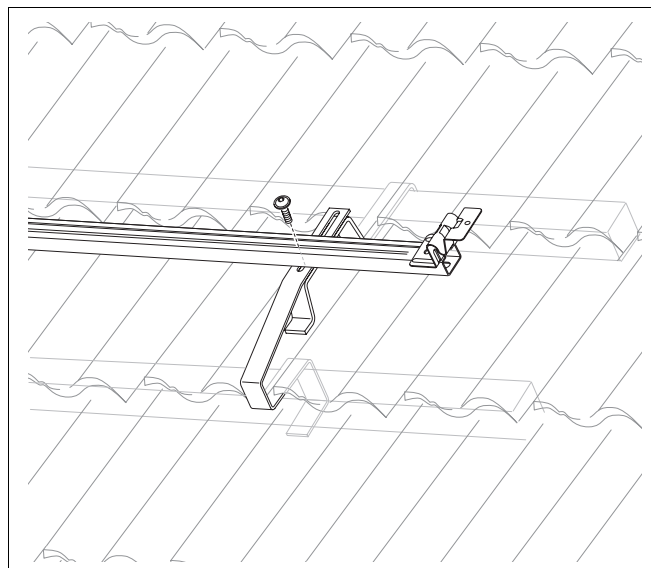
Screw preassembled profile rail to roof hook and additional roof hook
